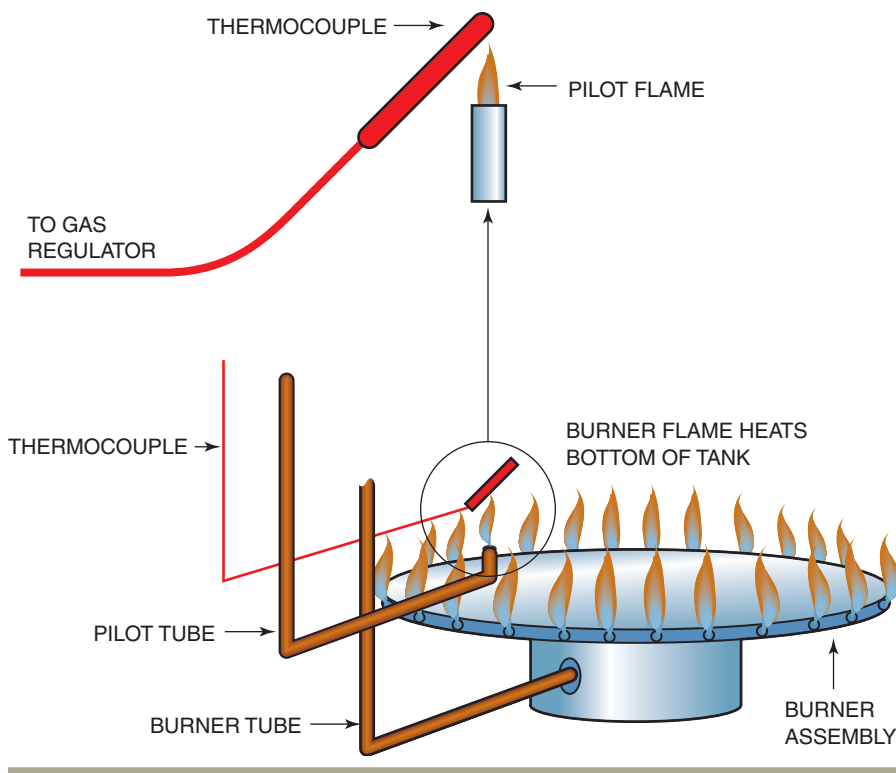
A burner assembly heats the external bottom of a storage tank.
